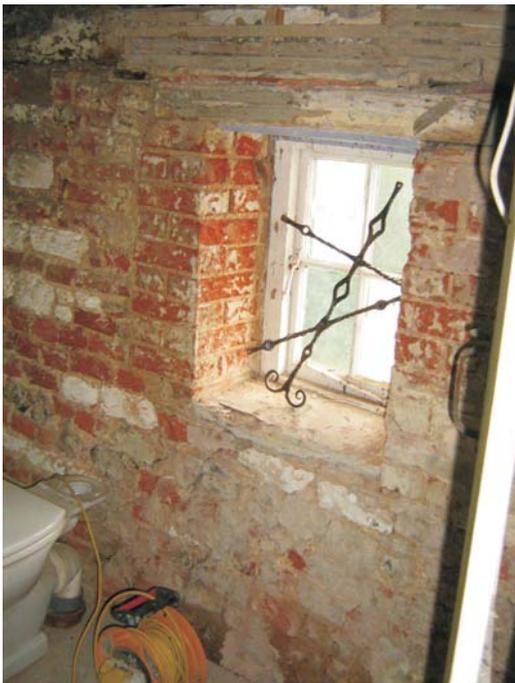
The 19th C bathroom window in the south wall of the room within the chalk block and brick built fabric of the wall
